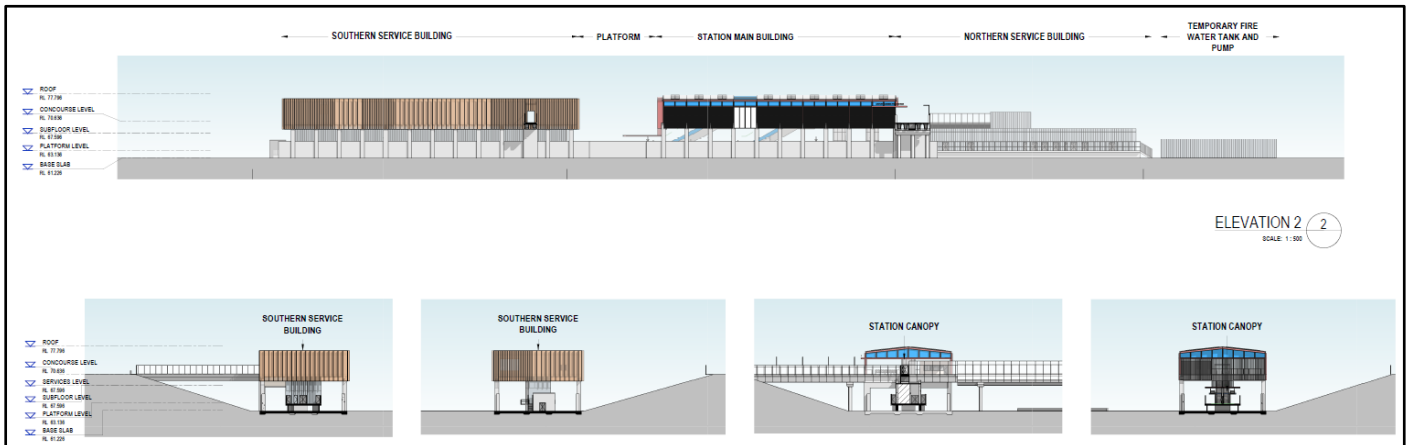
ABP STATION ARCHITECTURAL ELEVATIONS (PRELIMINARY)
